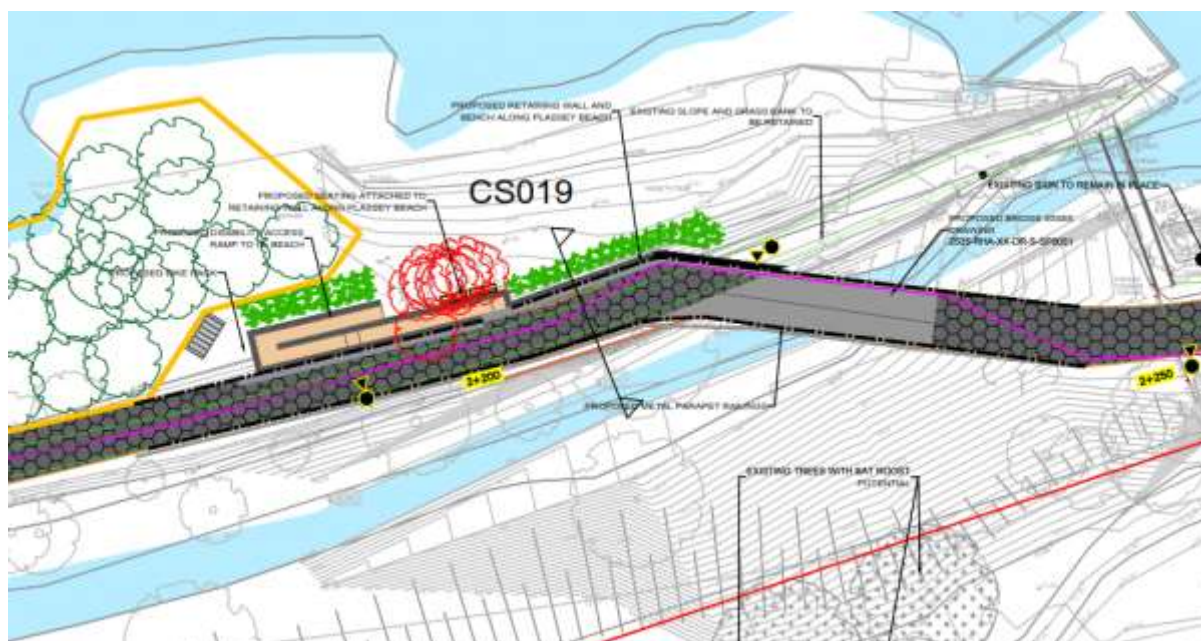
Proposed plan of ramp and Bridge 5 at Plassey Beach
